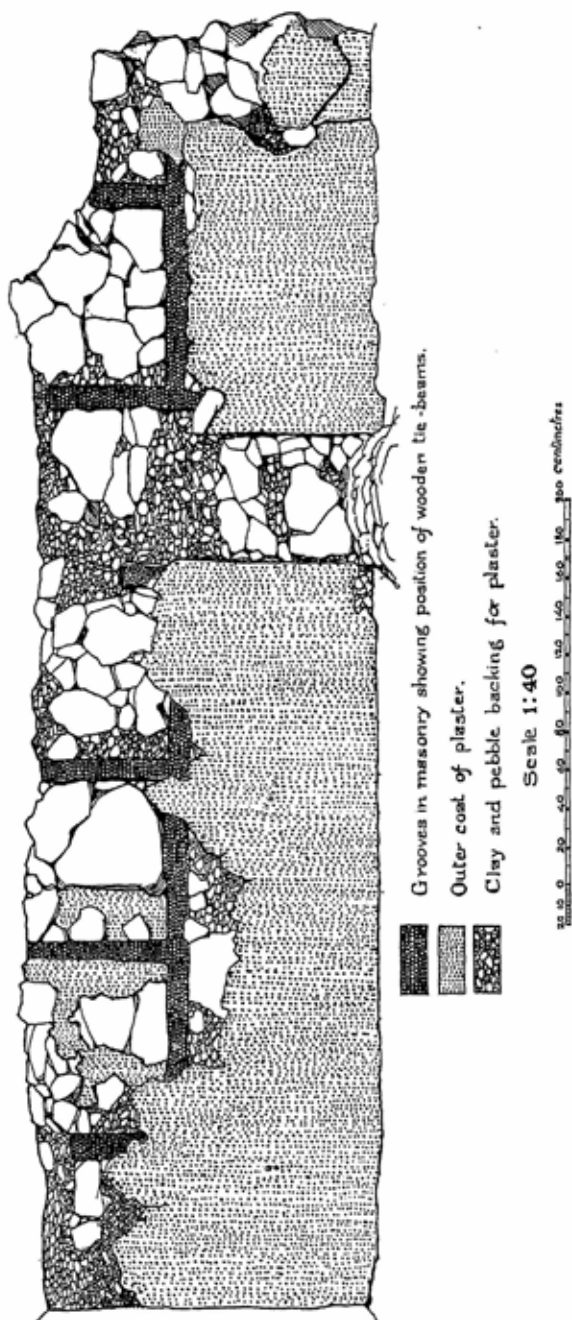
SOUTH HOUSE: NORTH WALLS OF WEST AND CENTRAL ROOMS, SHEWING INSERTION OF TIMBER FRAME AND APPLICATION OF CLAY PLASTER.
